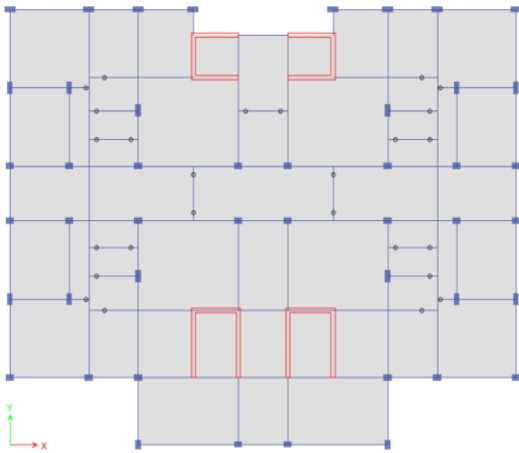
Architectural Plan of the Structure for all different sloped grounds
